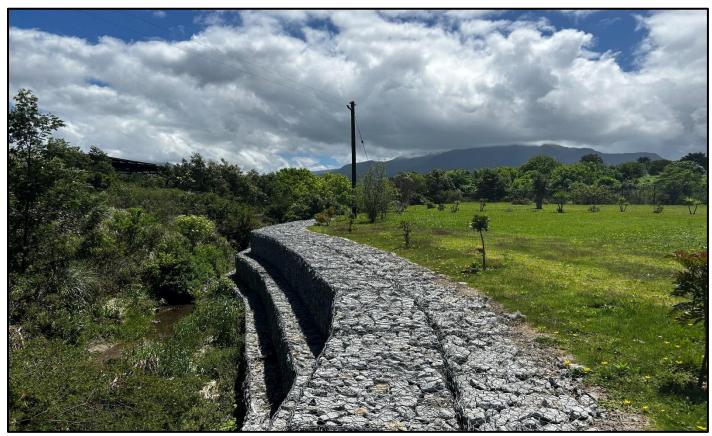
Gabions that have been installed, work area that has been rehabiltated and trees that have been planted.
